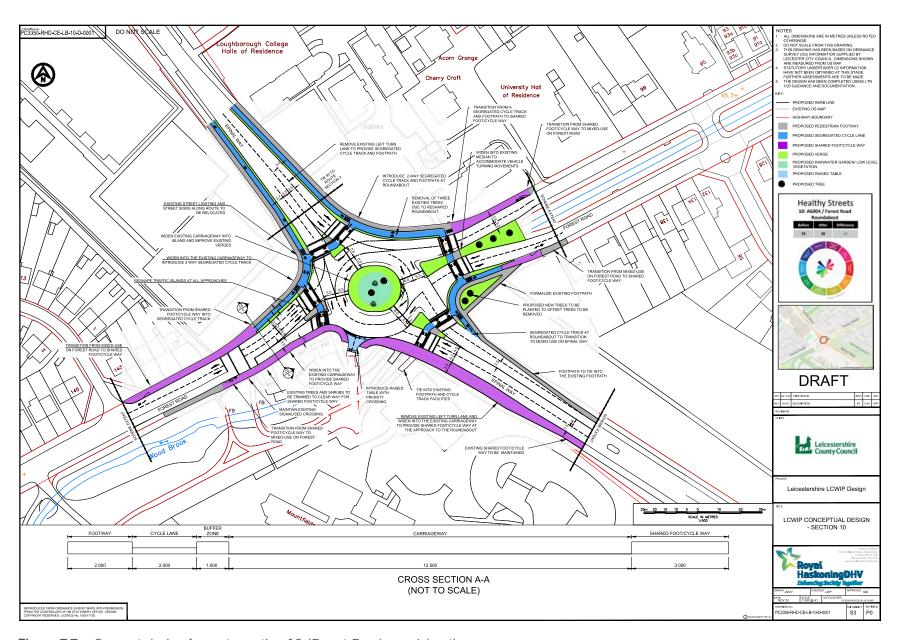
Concept design for route section 10 (Forest Road roundabout)
